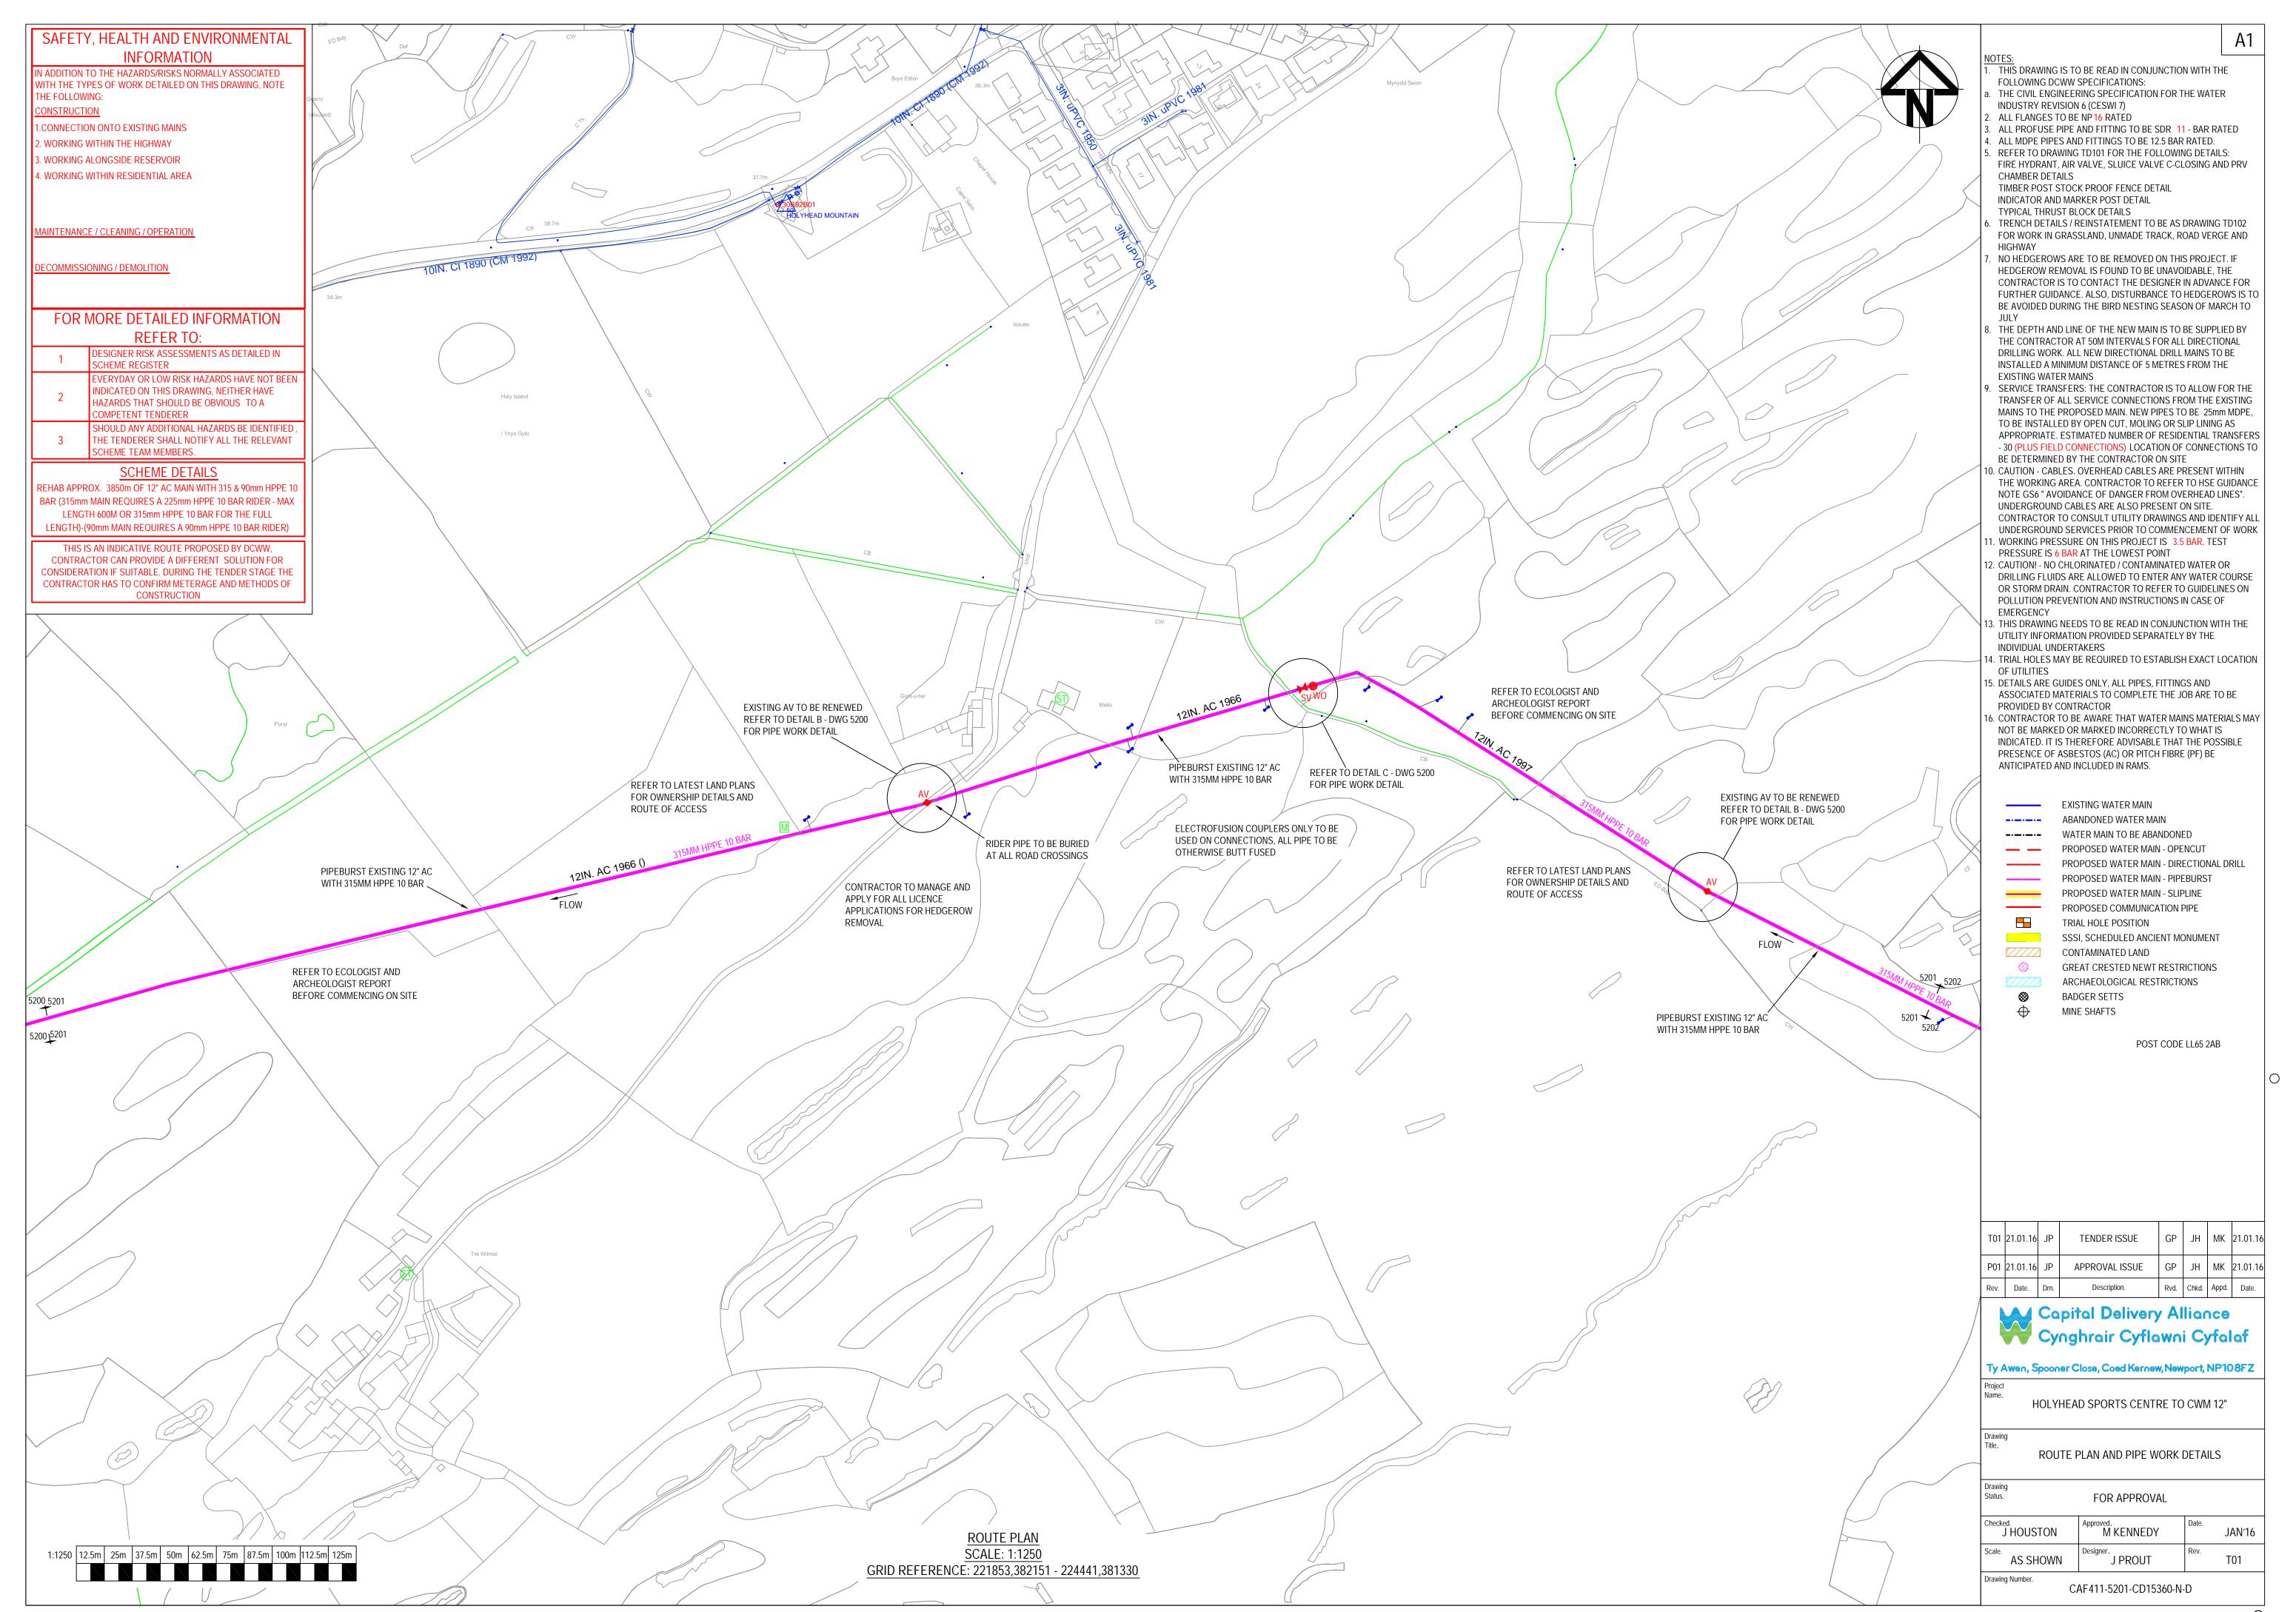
Reproduction of Dwr Cymru Drawing CAF411-5201-CD15360-N-D-T01, detailing Section A to B, which will be completed using pipebursting
